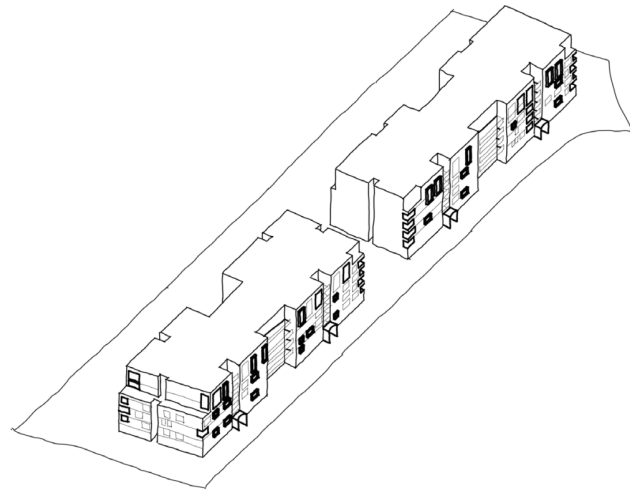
Building 2.3 Key Architectural and Urban Design Drivers
